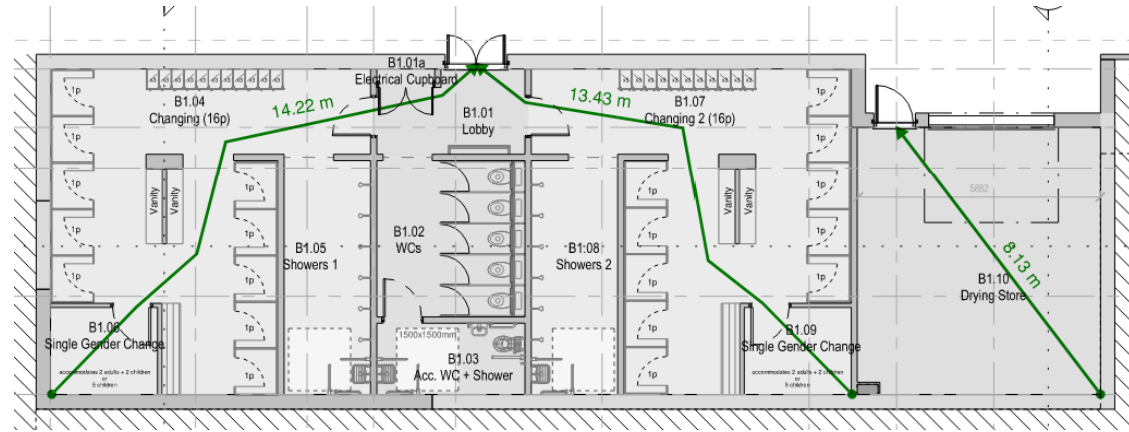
Main Building Travel Distances – Lower Ground Floor
